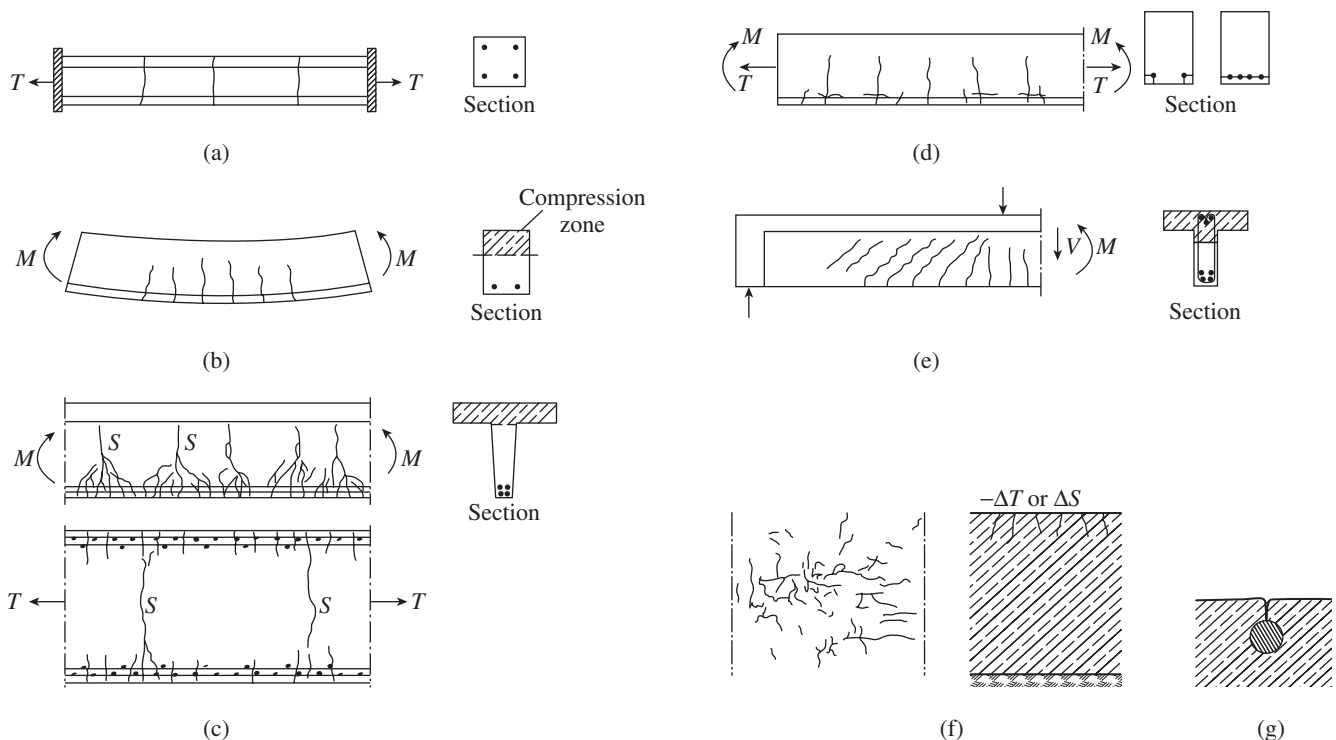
Types of cracks (a) Tension cracks (b) Bending with or without axial load (c) Thick sections (d) Secondary and bond cracks (e) Shear cracks (f) Surface cracks (g) Longitudinal cracks along reinforcing bars
